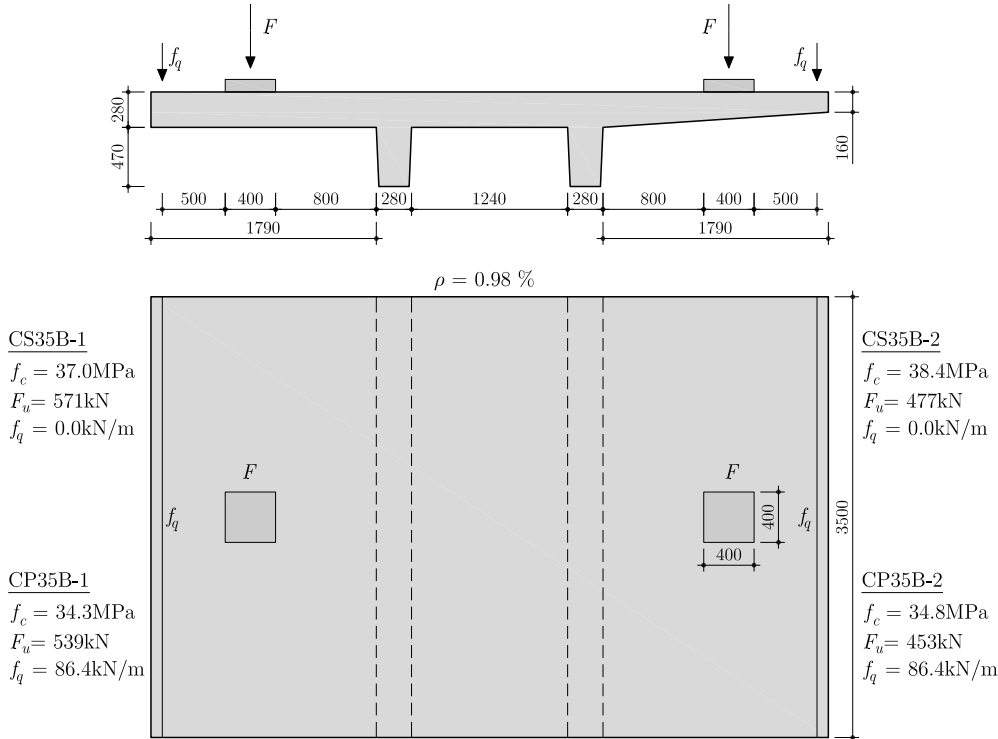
Tests on cantilever slabs performed by Reissen and Hegger [Rei13b] (dimensions in [mm])
